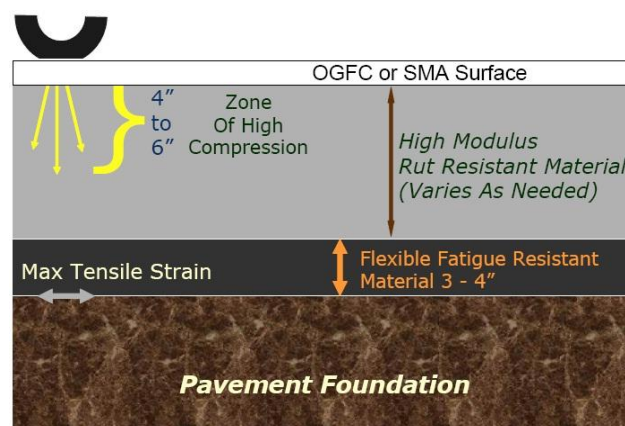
Perpetual Pavement Design Concept [Newcomb, 2001]
